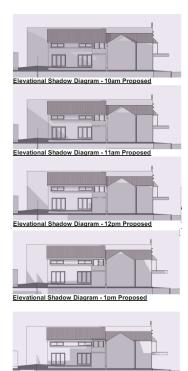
Subject Proposal - Extract of proposed shadows received by the adjoining property.
